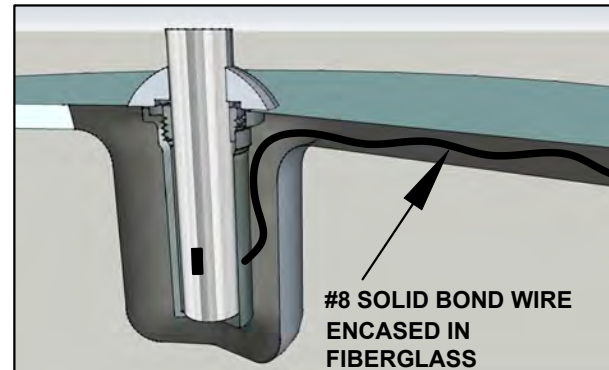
DETAIL REFLECTS ANCHOR INSTALLATION IN NESPA SHELLS ONLY.
